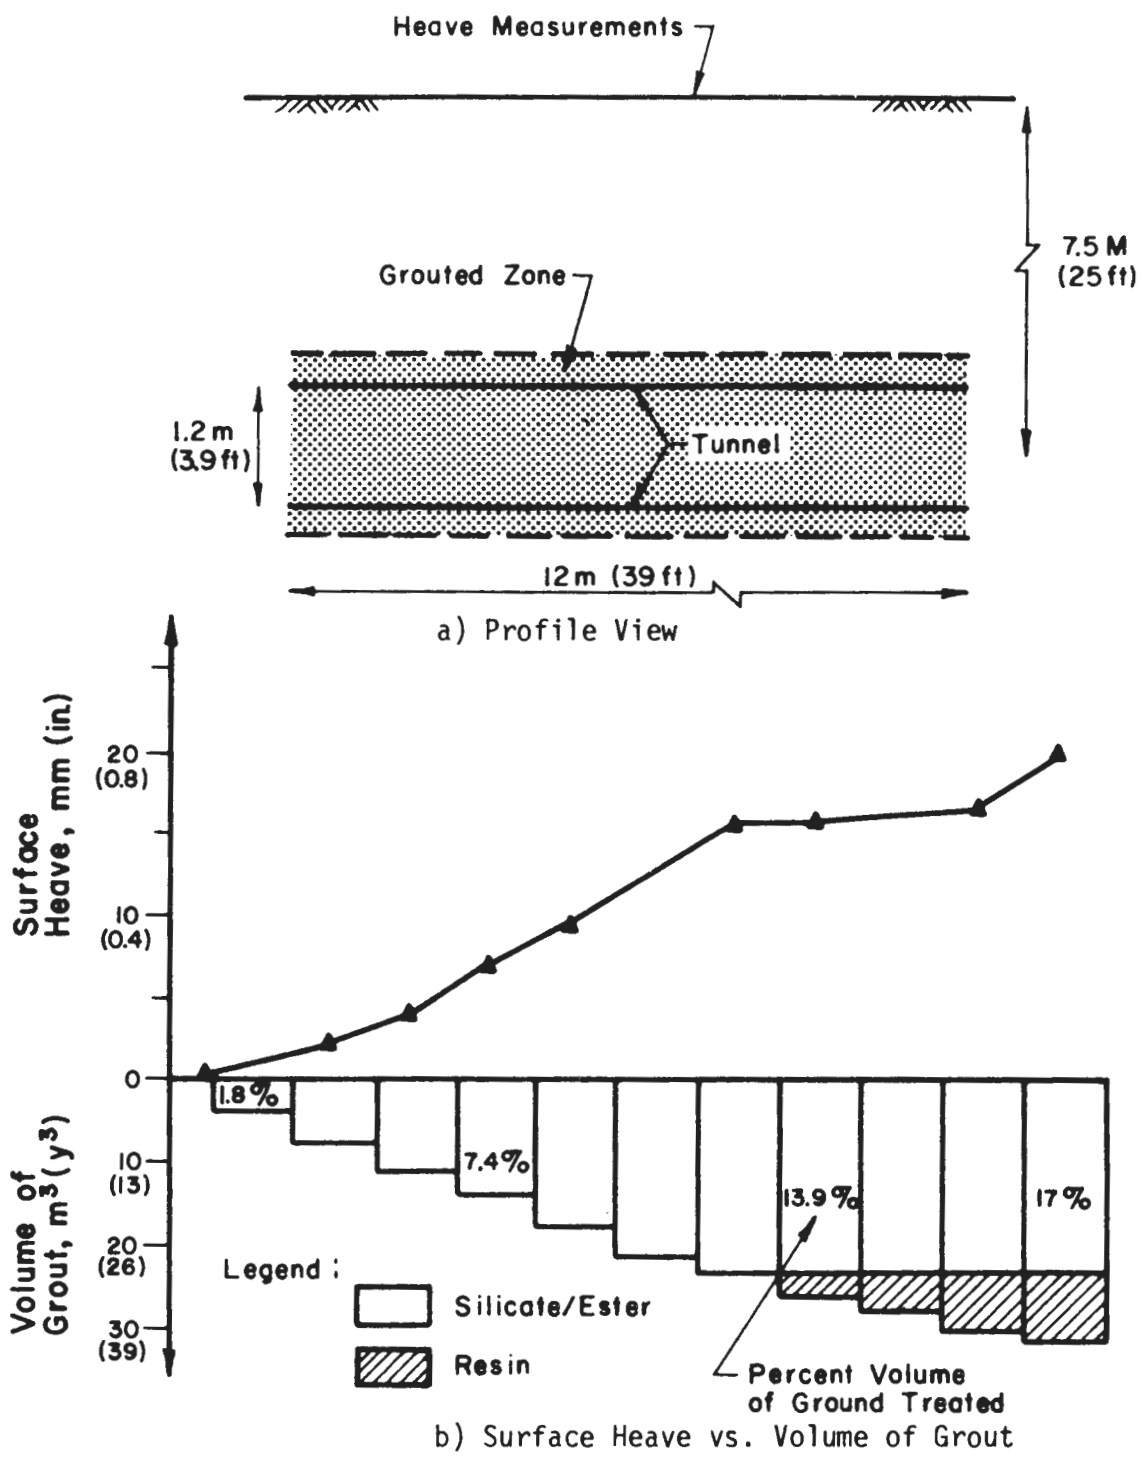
Volume of Injection and Surface Heave for Tunnel Grouting
